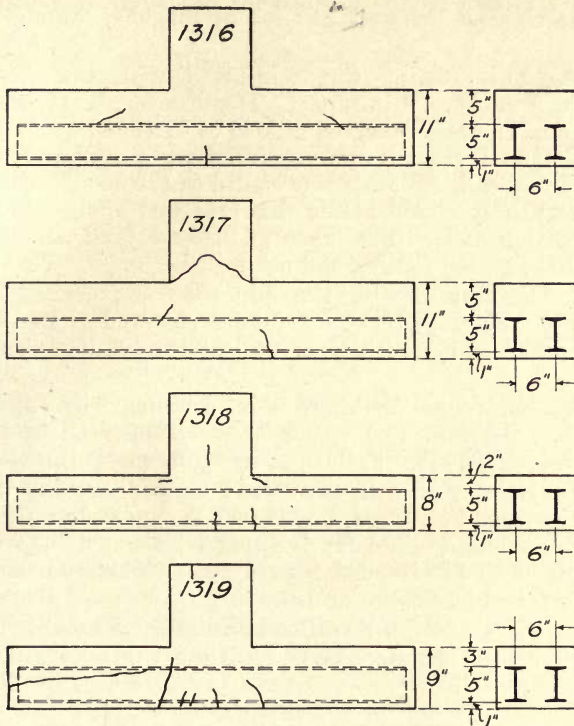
WALL FOOTINGS REINFORCED WITH I-BEAMS.
